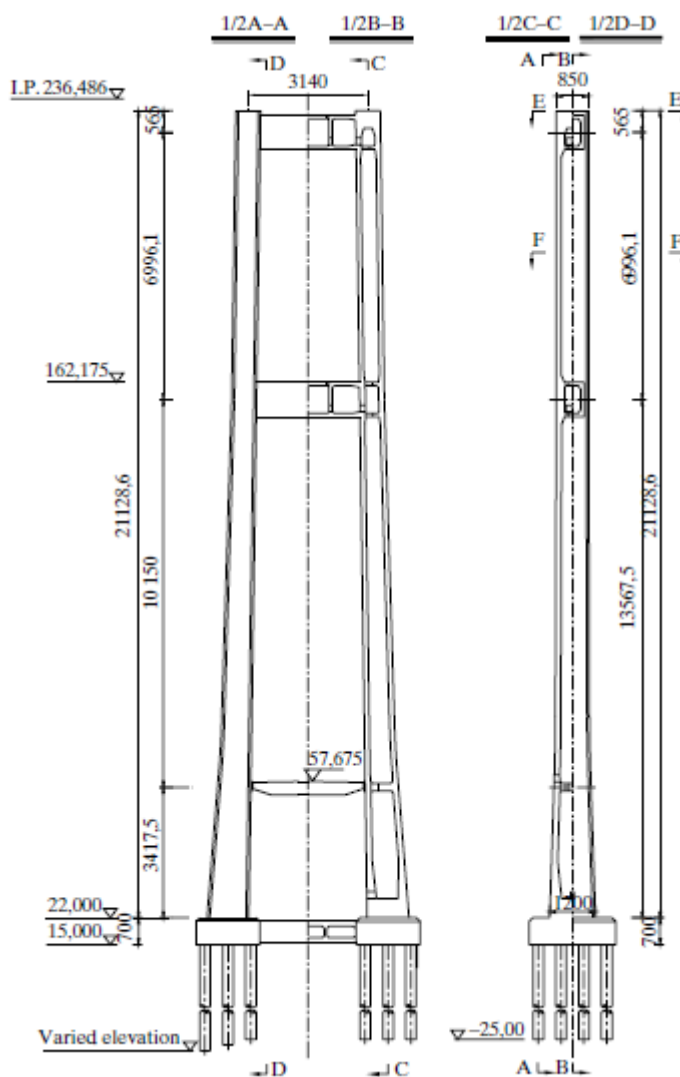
Arrangement of north pylon (Dimension in cm)[17]
